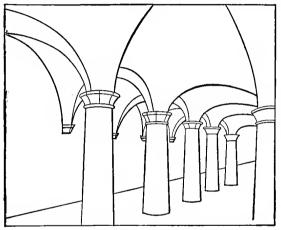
CONCRETE DOMED CONSTRUCTION.
